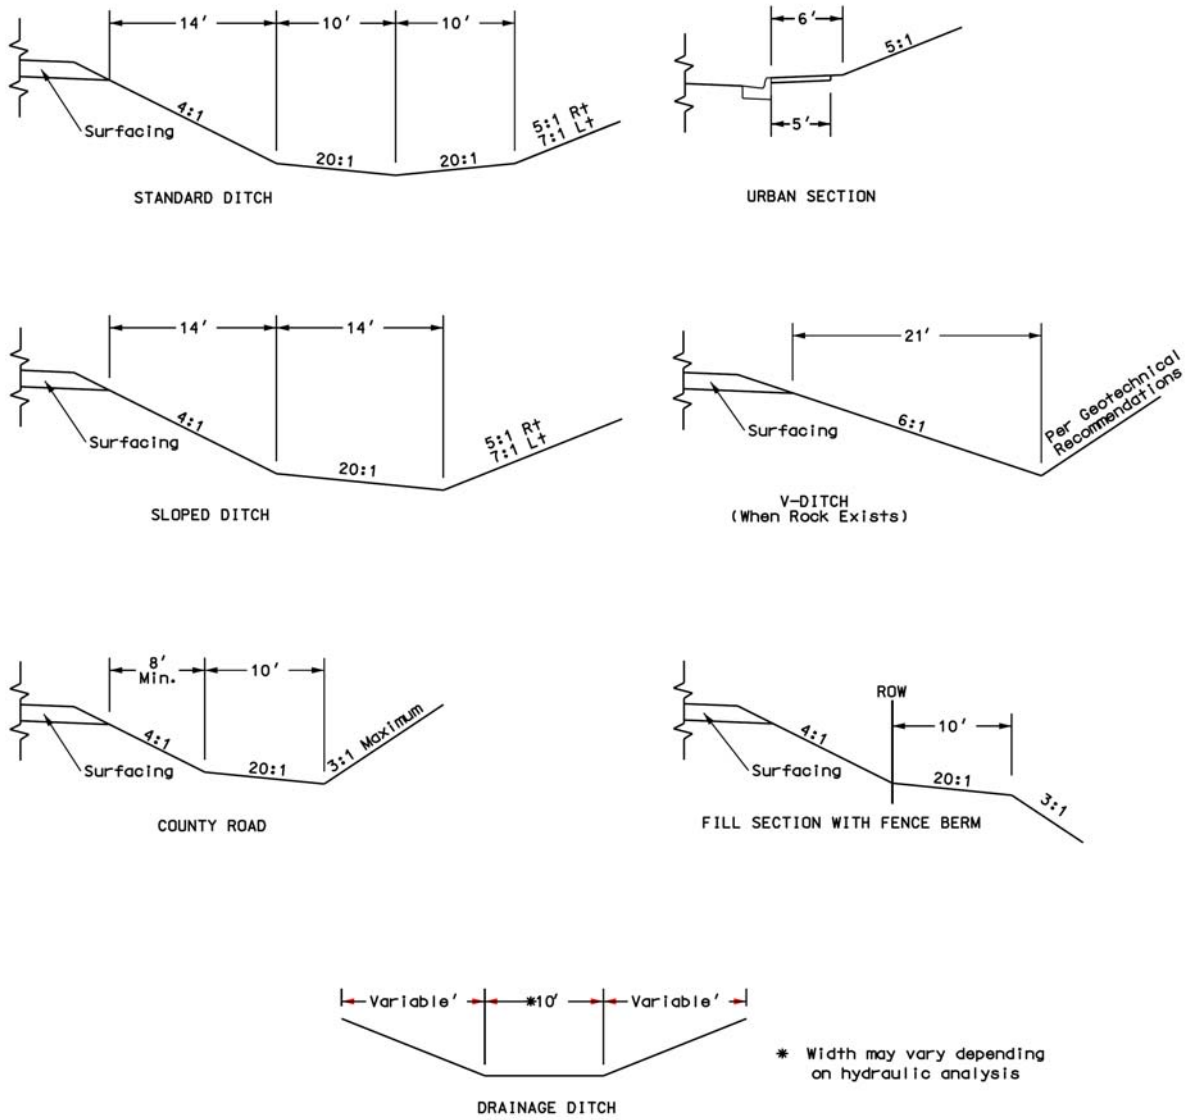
Typical Ditch Bottoms and Slope Criteria
